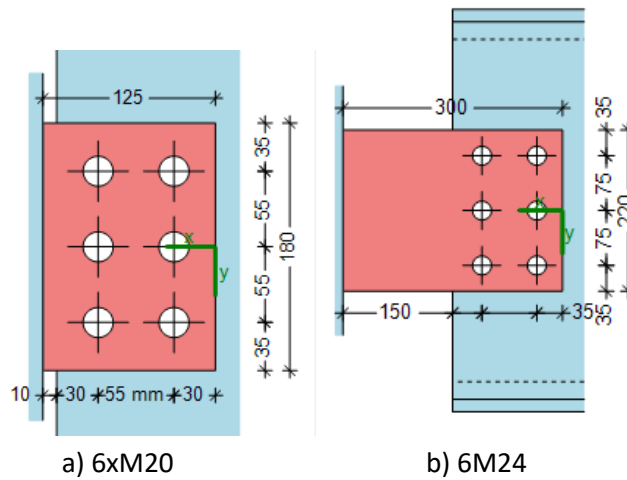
Fin plate beam-to-beam joints (a) B-A, B-C, b) B-D)
